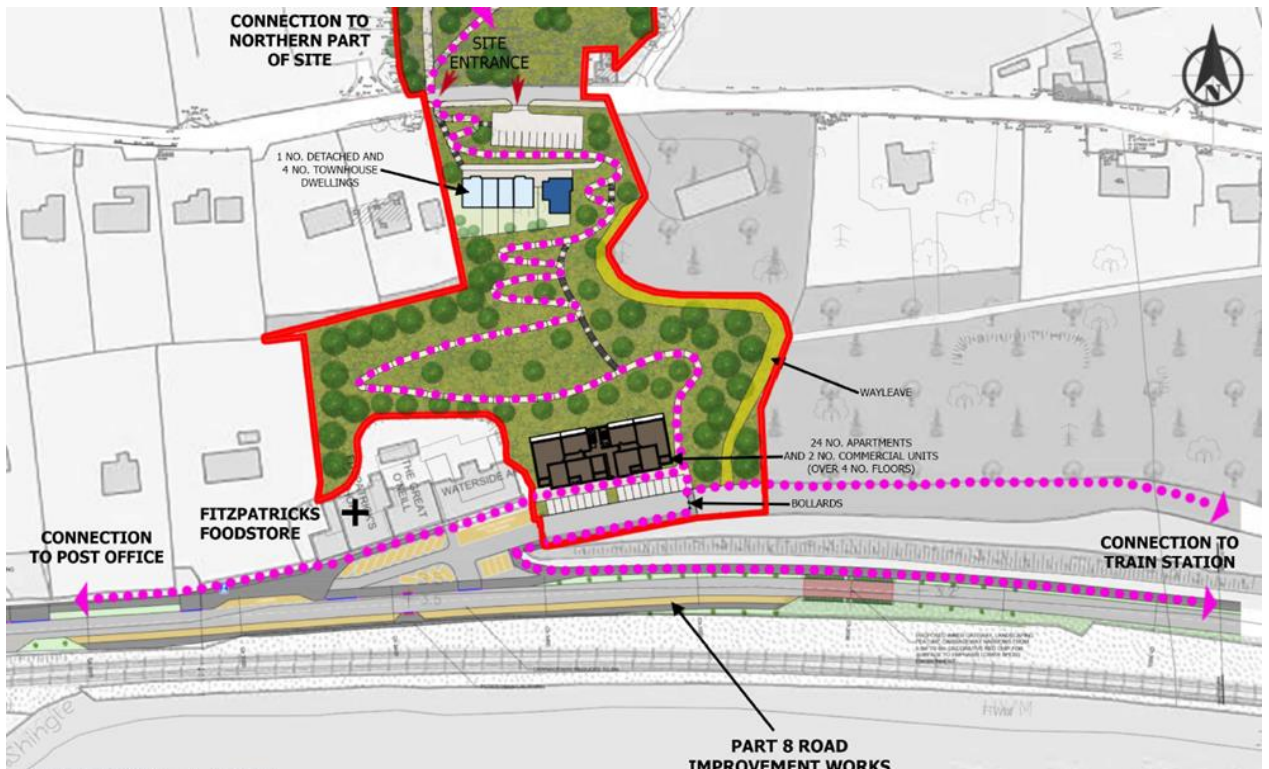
Layout of Southern Parcel presented at Section 247 Meeting – May 2021
